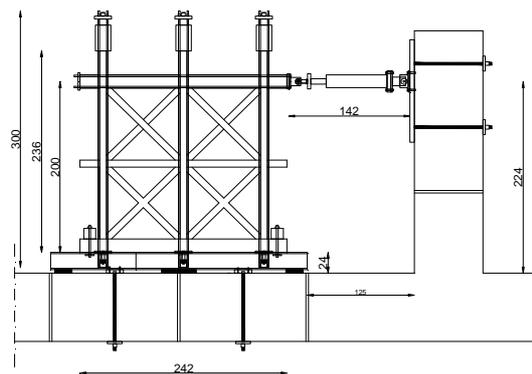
Test setup used in the experimental campaign (dimensions in cm)
